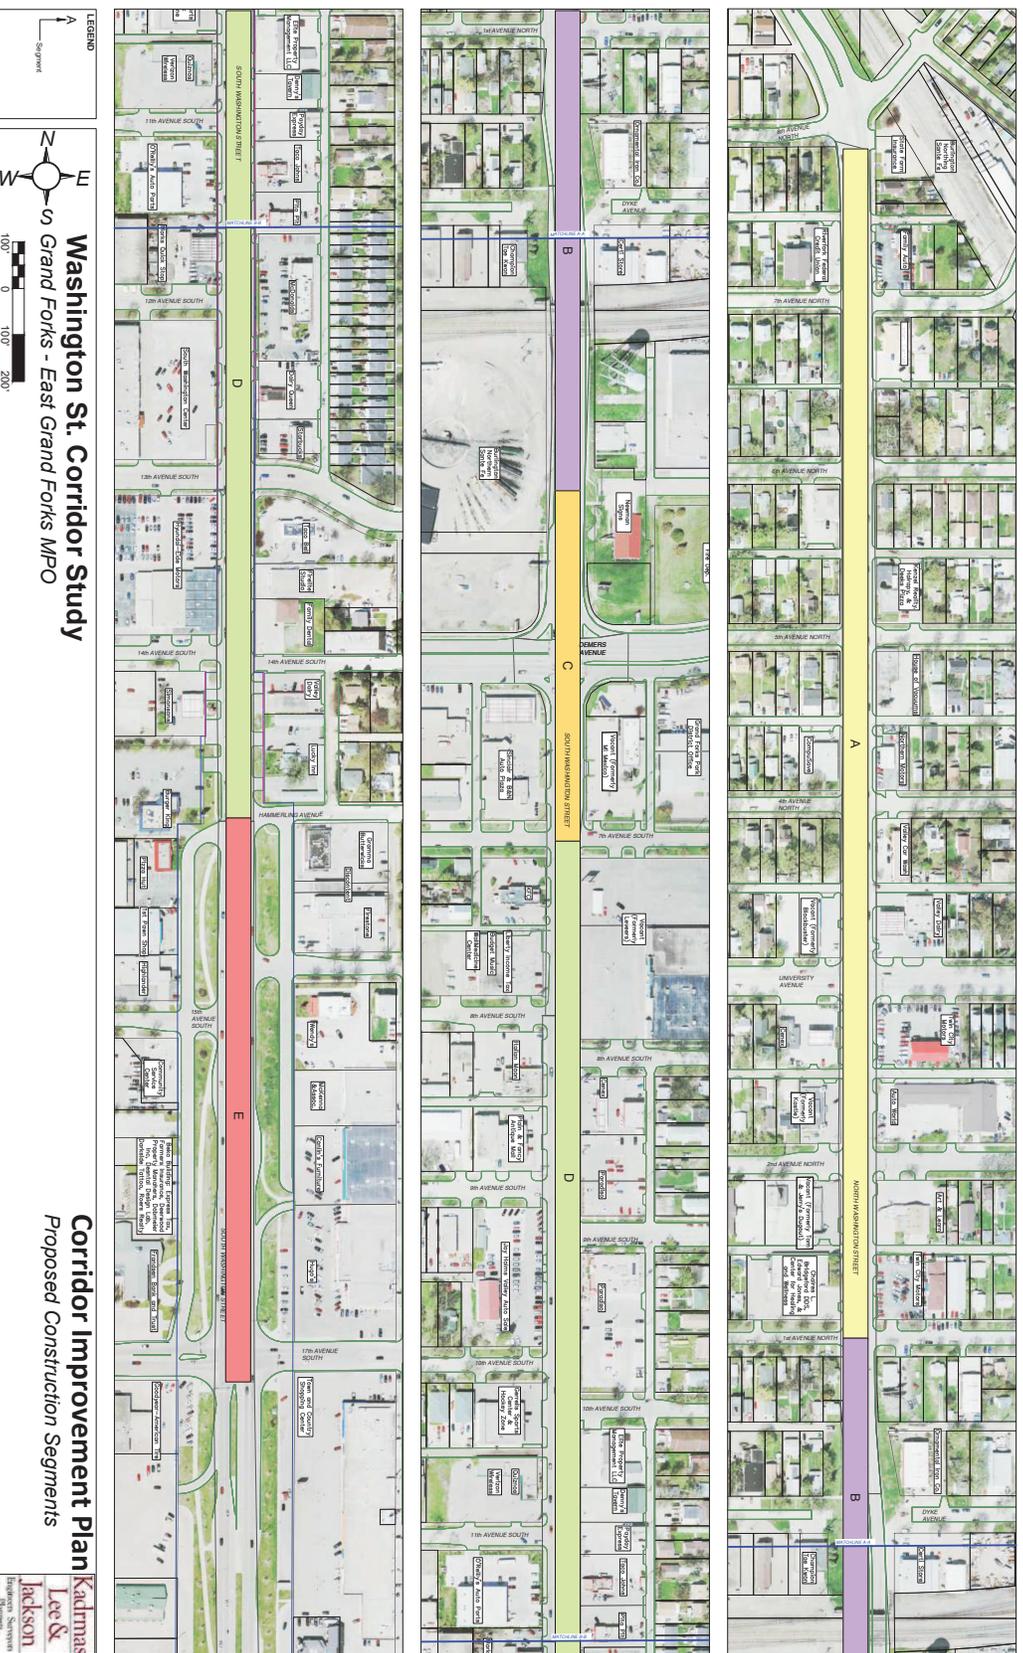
Corridor Improvement Plan Proposed Construction Segments
